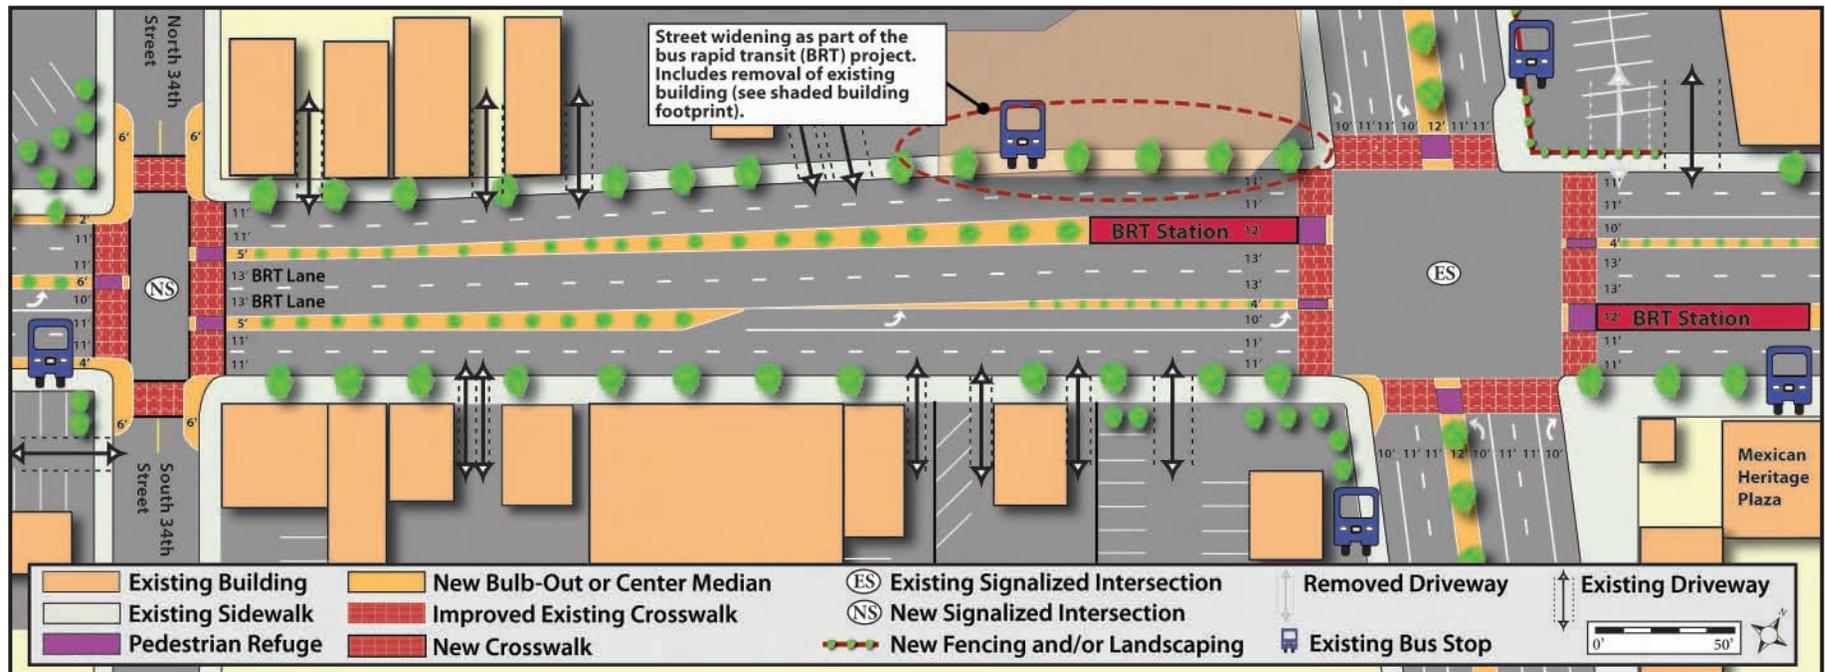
East Santa Clara Street/Alum Rock Avenue - Segment #9.
